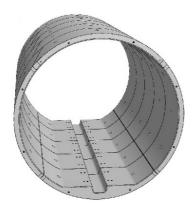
Drained tunnel: Cross joints for subsoil without groundwater
